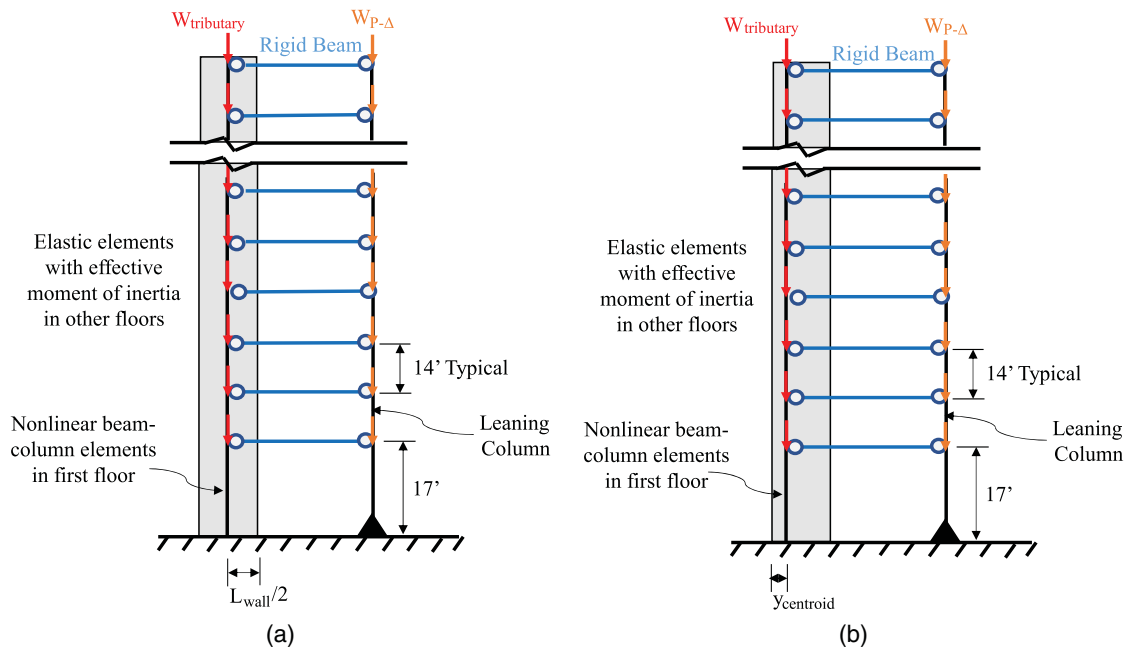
Representation of OpenSees models of (a) planar wall archetypes; and (b) C-shaped wall archetypes. (Note: 1 ft = 0.305 m.)
